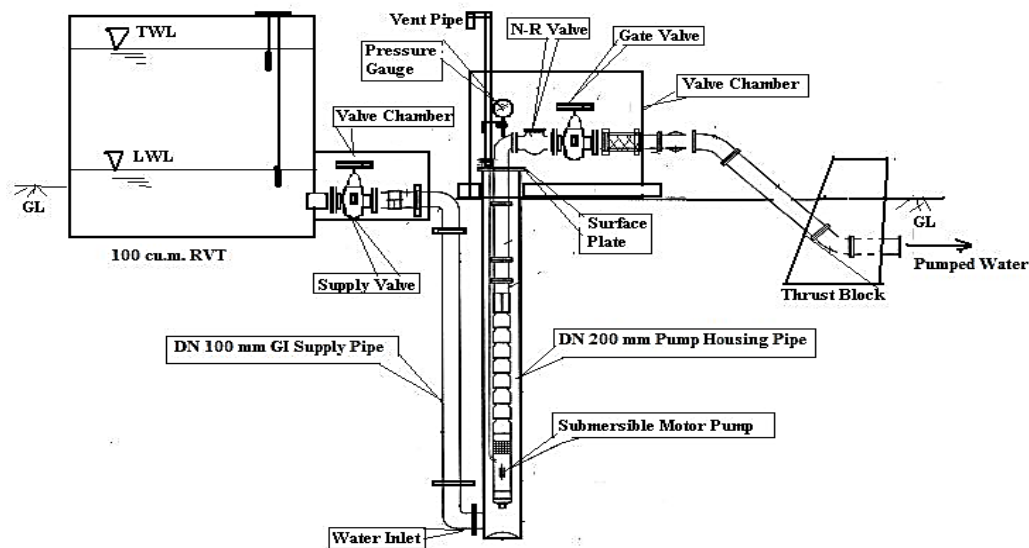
Submersible Pump Installation for Surface Water Pumping (Option 1)
